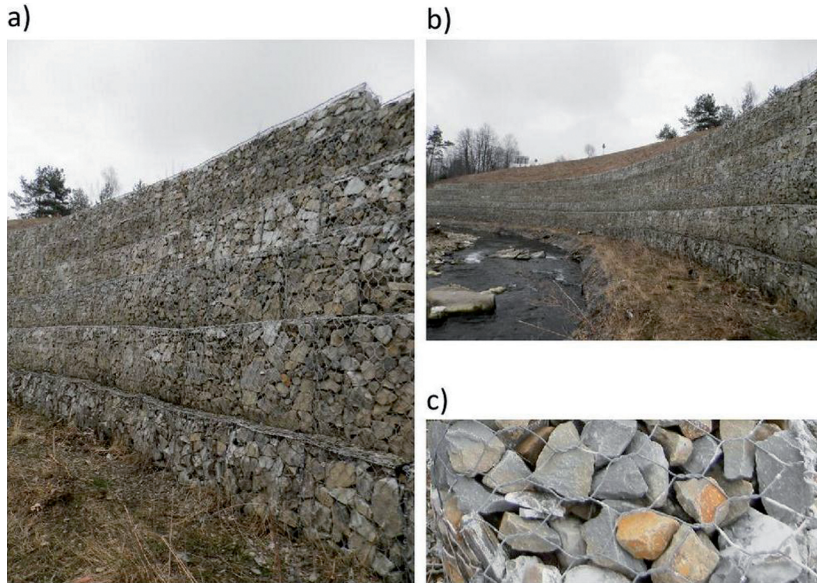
Gabion retaining wall a), b) whole structure c) close-up on mesh and filling
